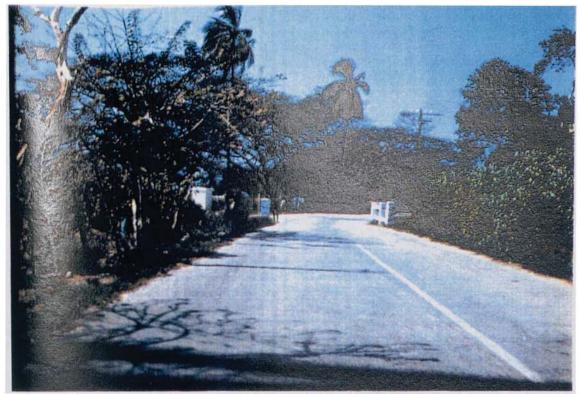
The poor road surface on the Road of Study in Jamaica.
